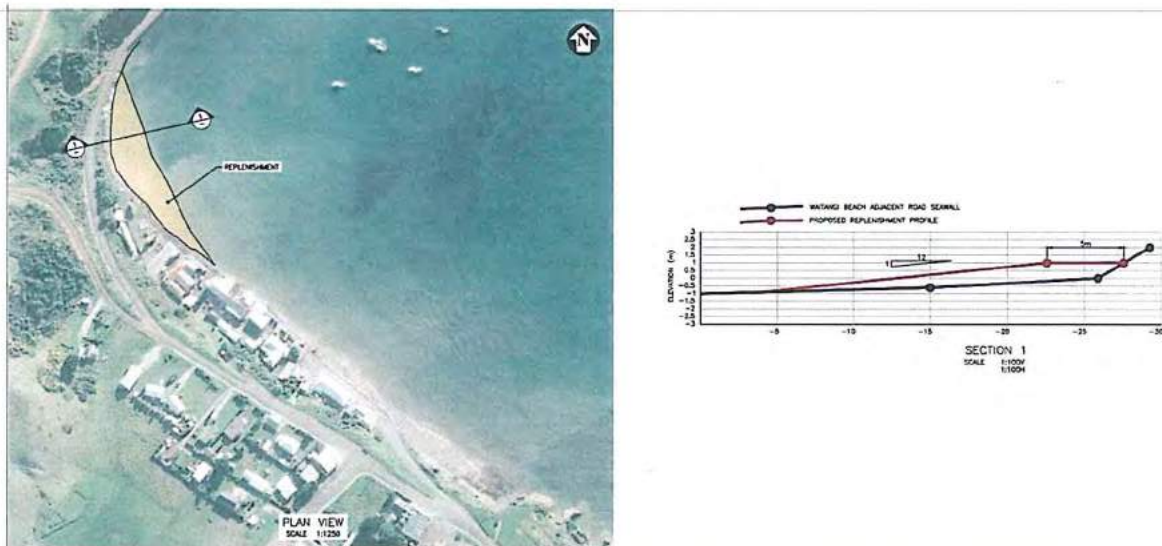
Initial beach sand nourishment design extent and profile concept (note sand was also placed further east along Town Beach during construction)
